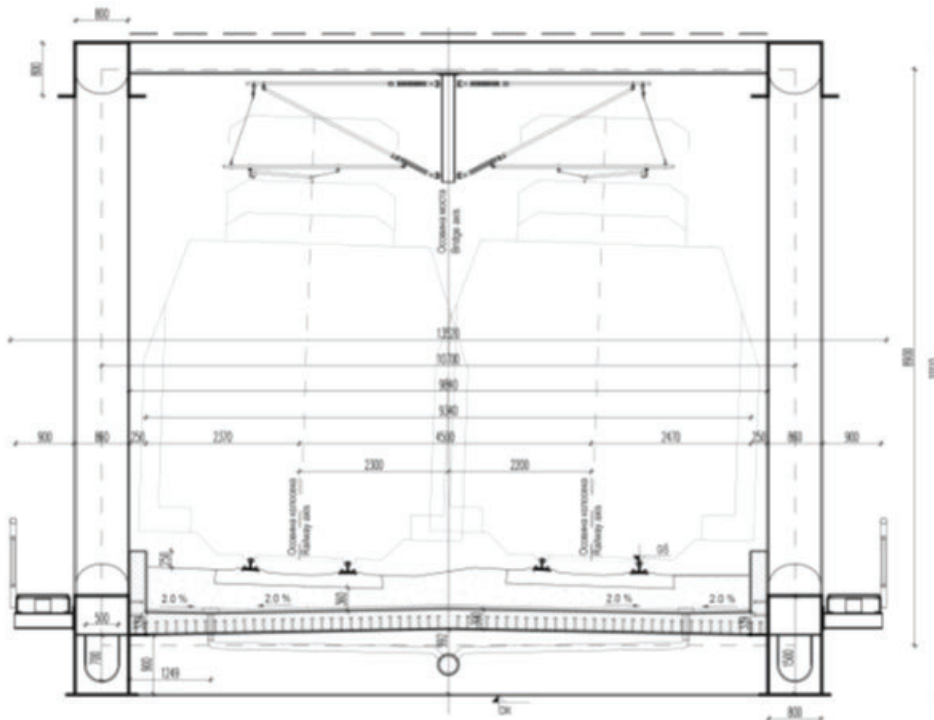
Bridge at km 117+155 – Typical cross section of steel structure
